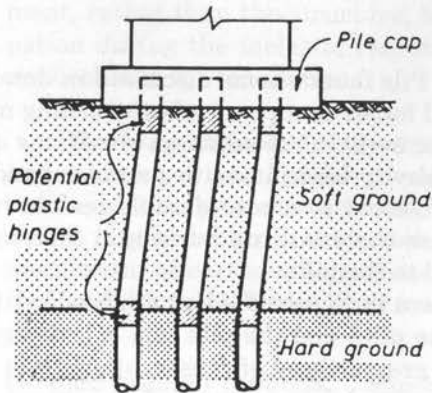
Locations of potential plastic hinges in embedded piles.
